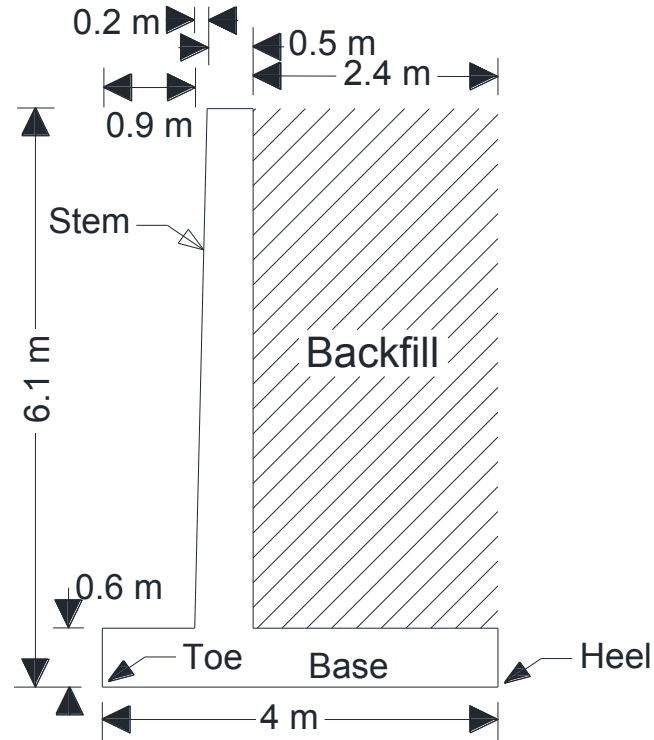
Initial configuration of finite element model of cantilever earth-retaining wall in Green and Ebeling study (2003)
